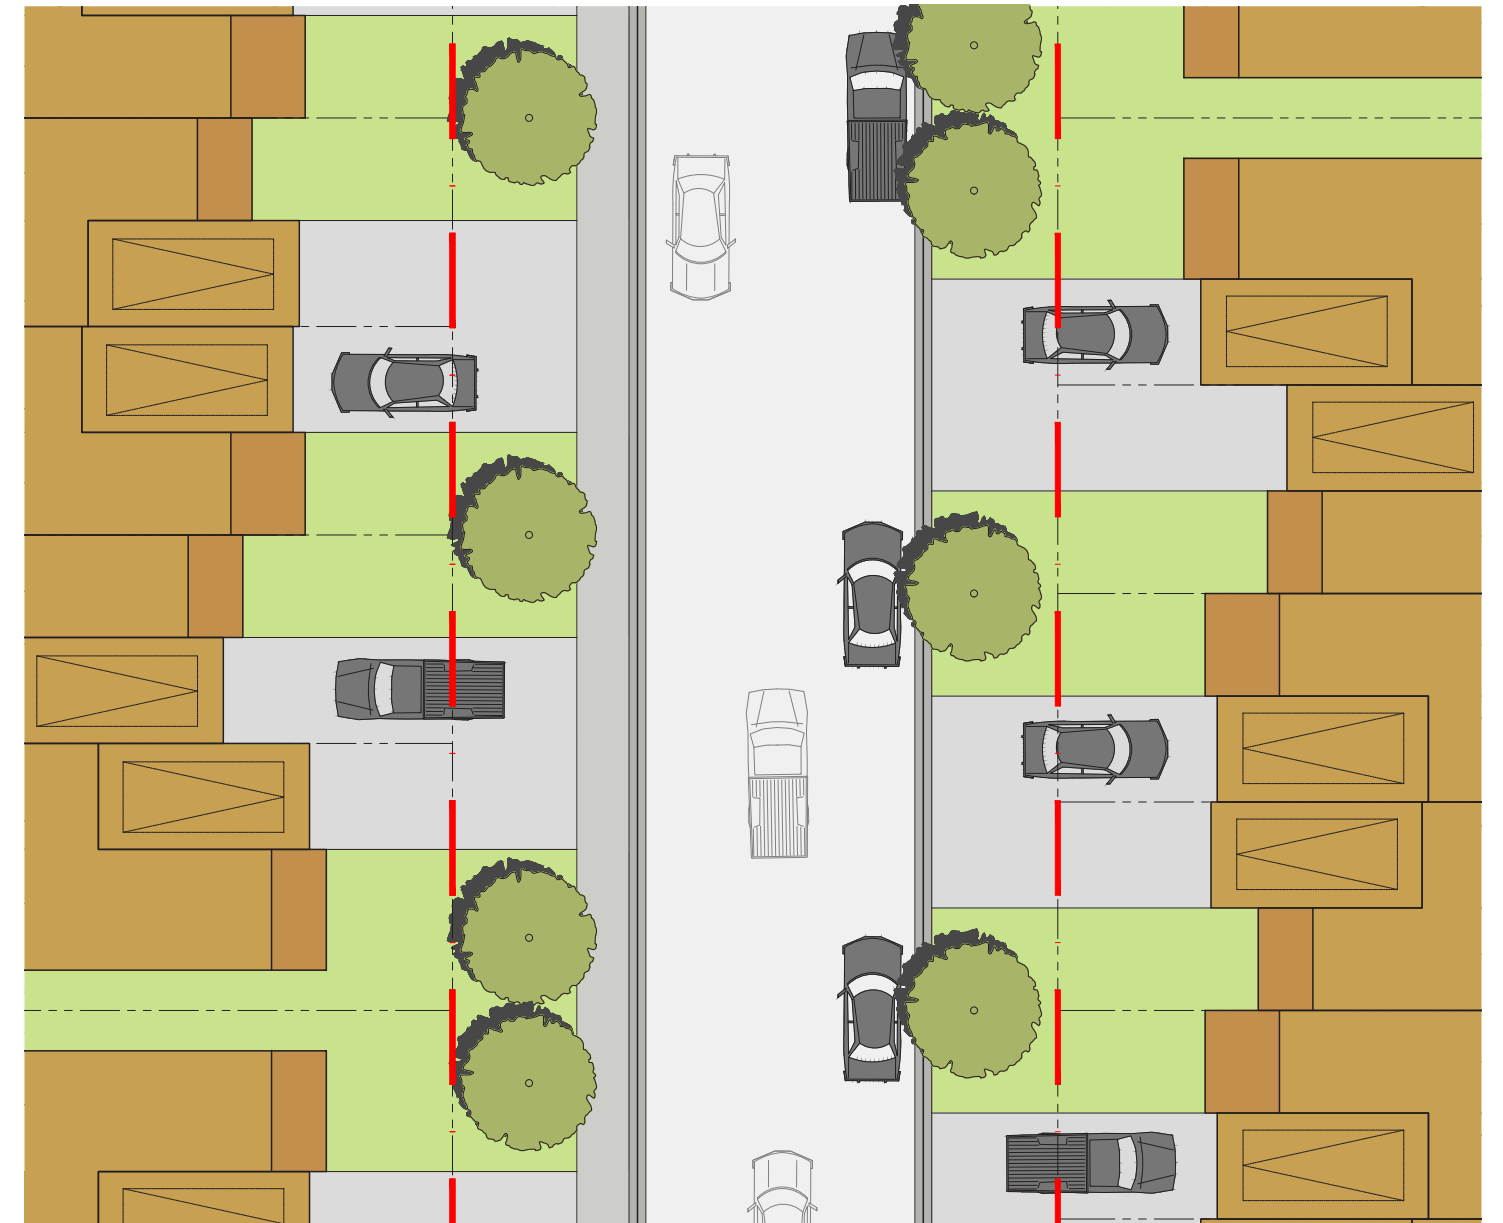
Front-Drive Townhomes On-Street Parking Configuration
